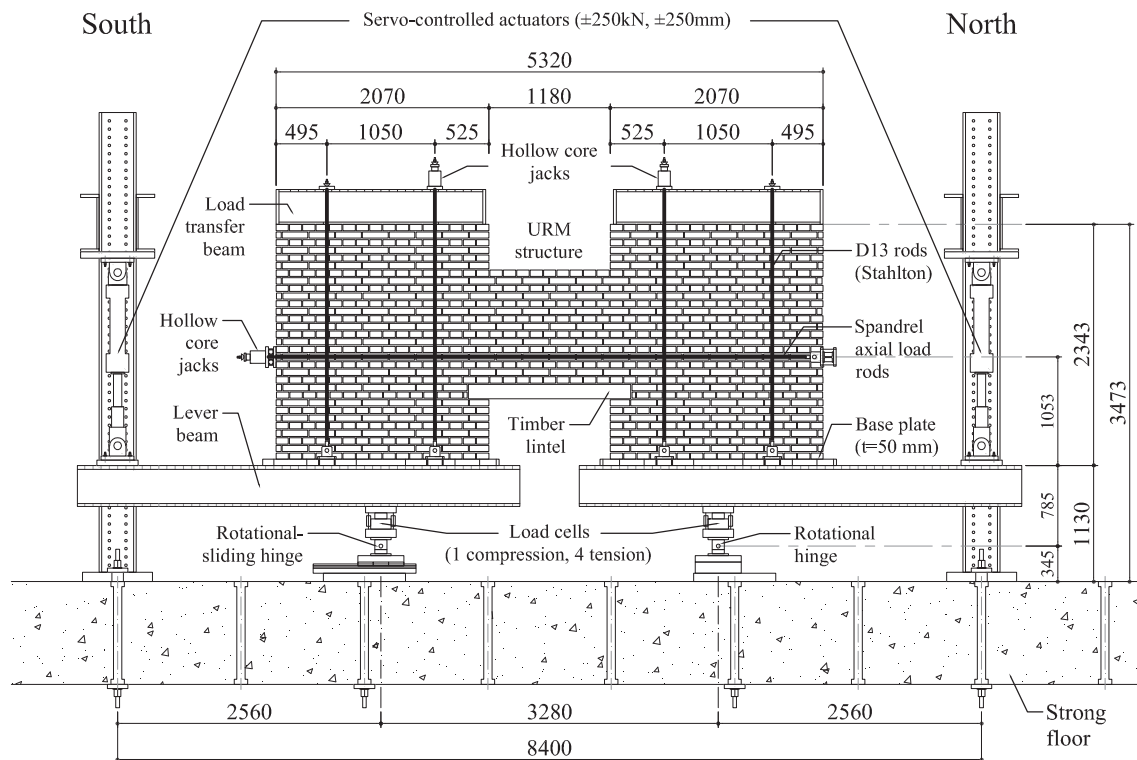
Drawing of the test setup for the masonry spandrels with timber lintel (TUA and TUB). View from the East without side restraint. All dimensions in [mm].
